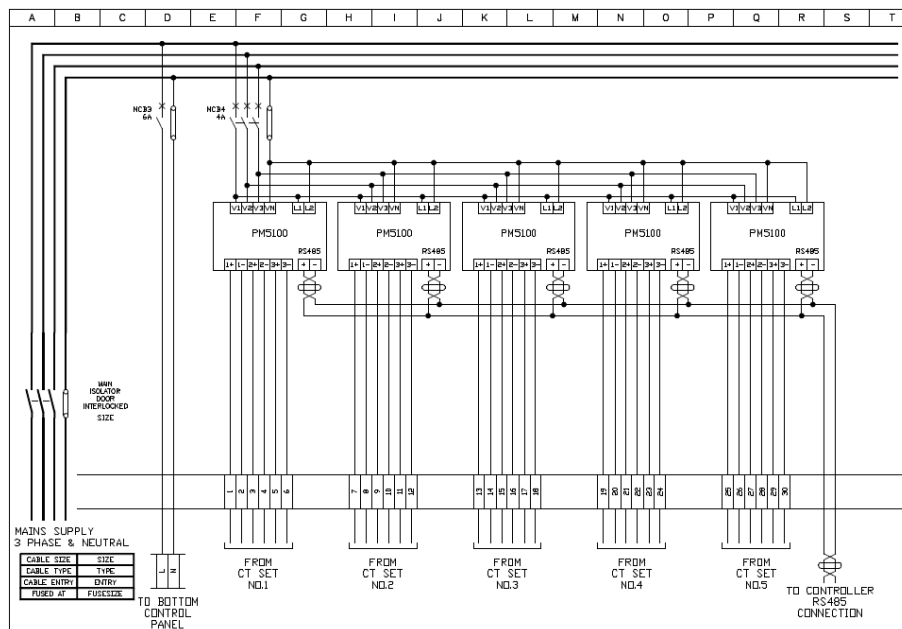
CLARENDON BUILDING NEW METERS LAYOUT SCHEMA.
